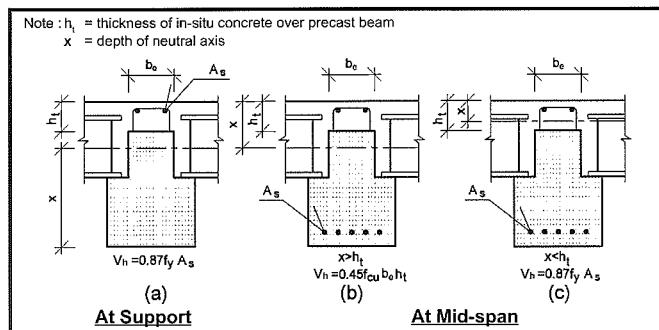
Horizontal Shear Force In Composite Concrete Section
